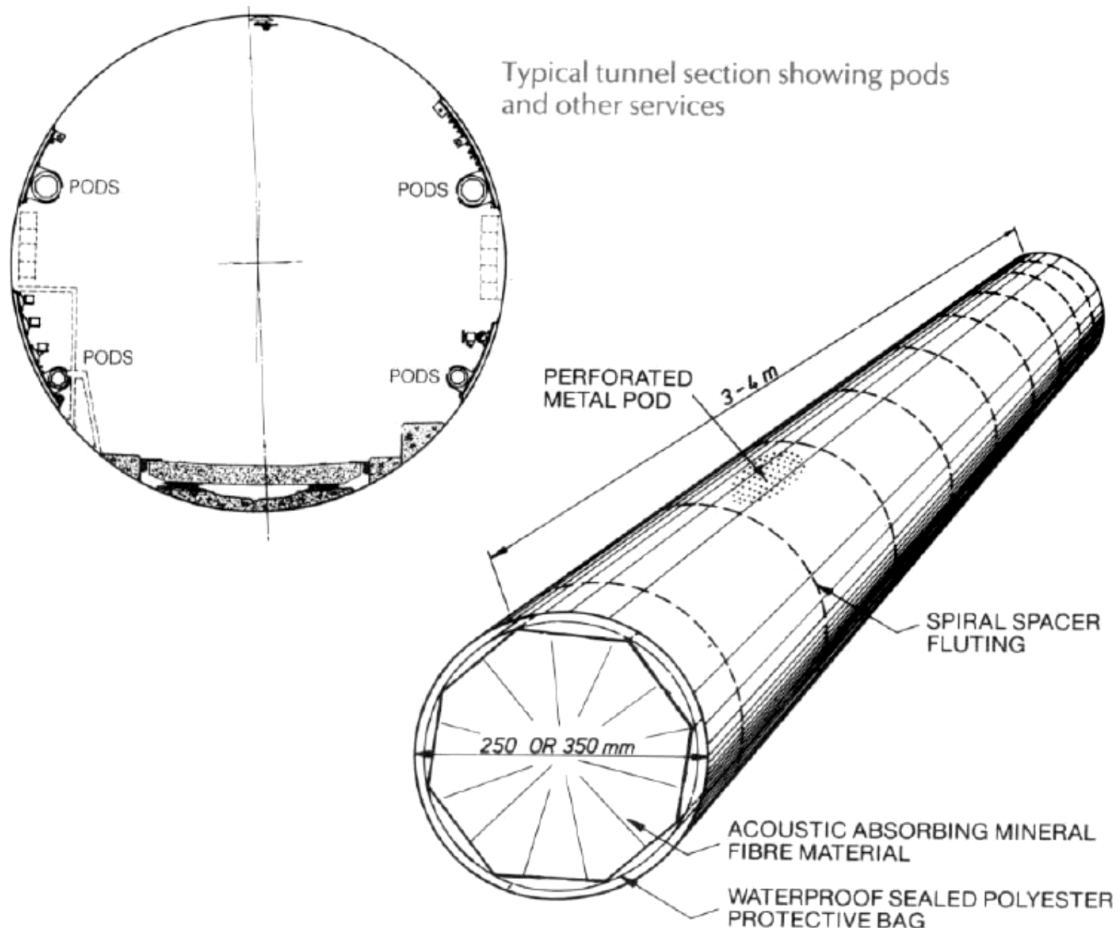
Melbourne Underground Rail Link absorptive pod detail and tunnel locations.
